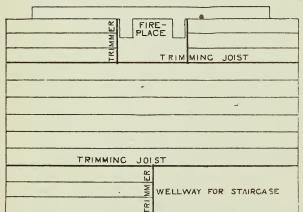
Joists, etc., round Fireplace and Staircase Well.
